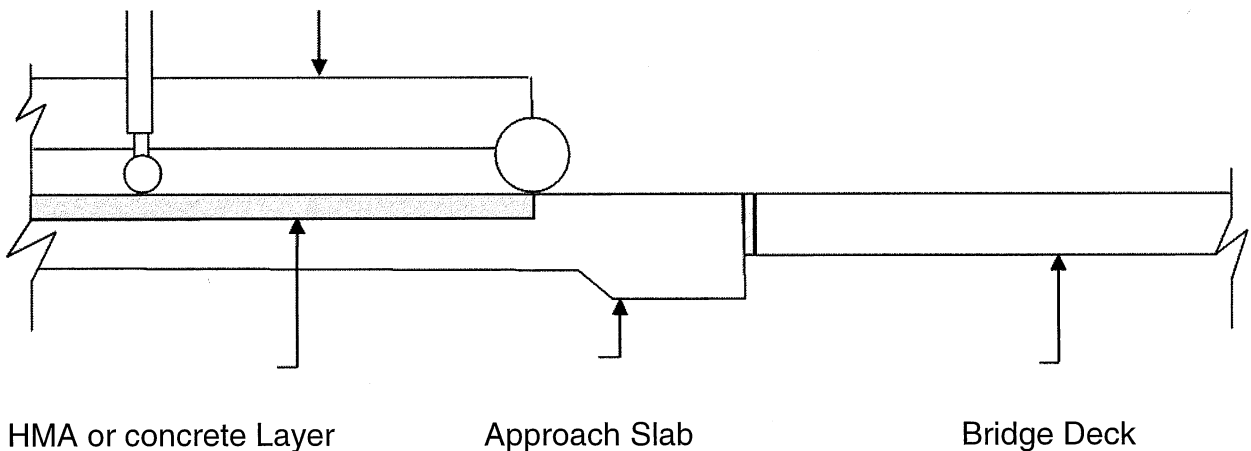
12-foot Rolling Straightedge at Approach Slab
